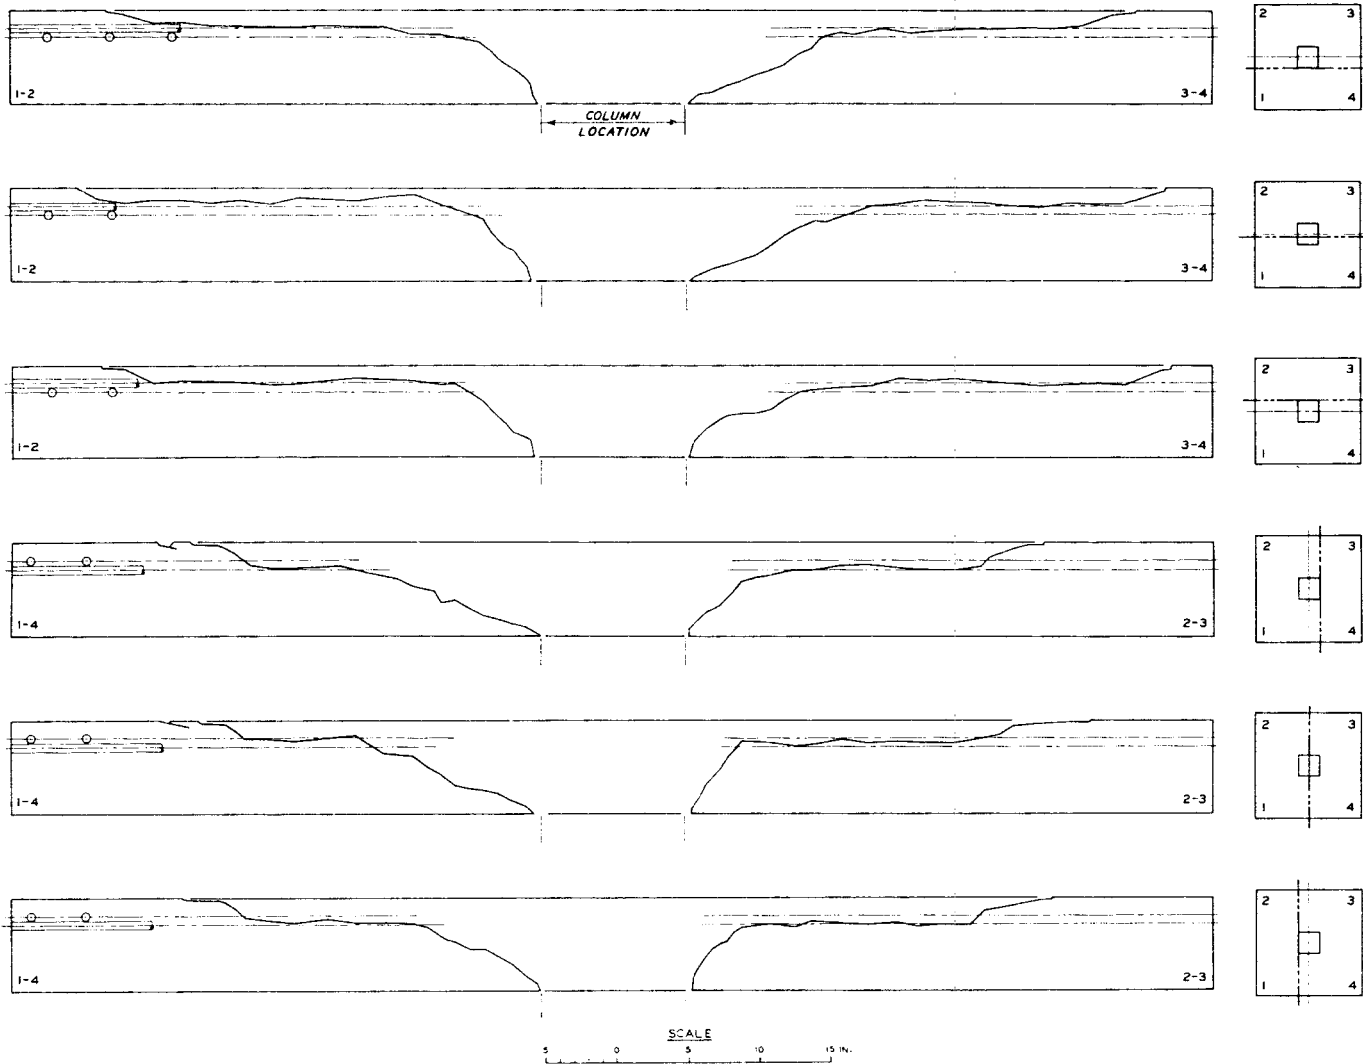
Profiles of slab failure surface, Specimen D2150-2.
